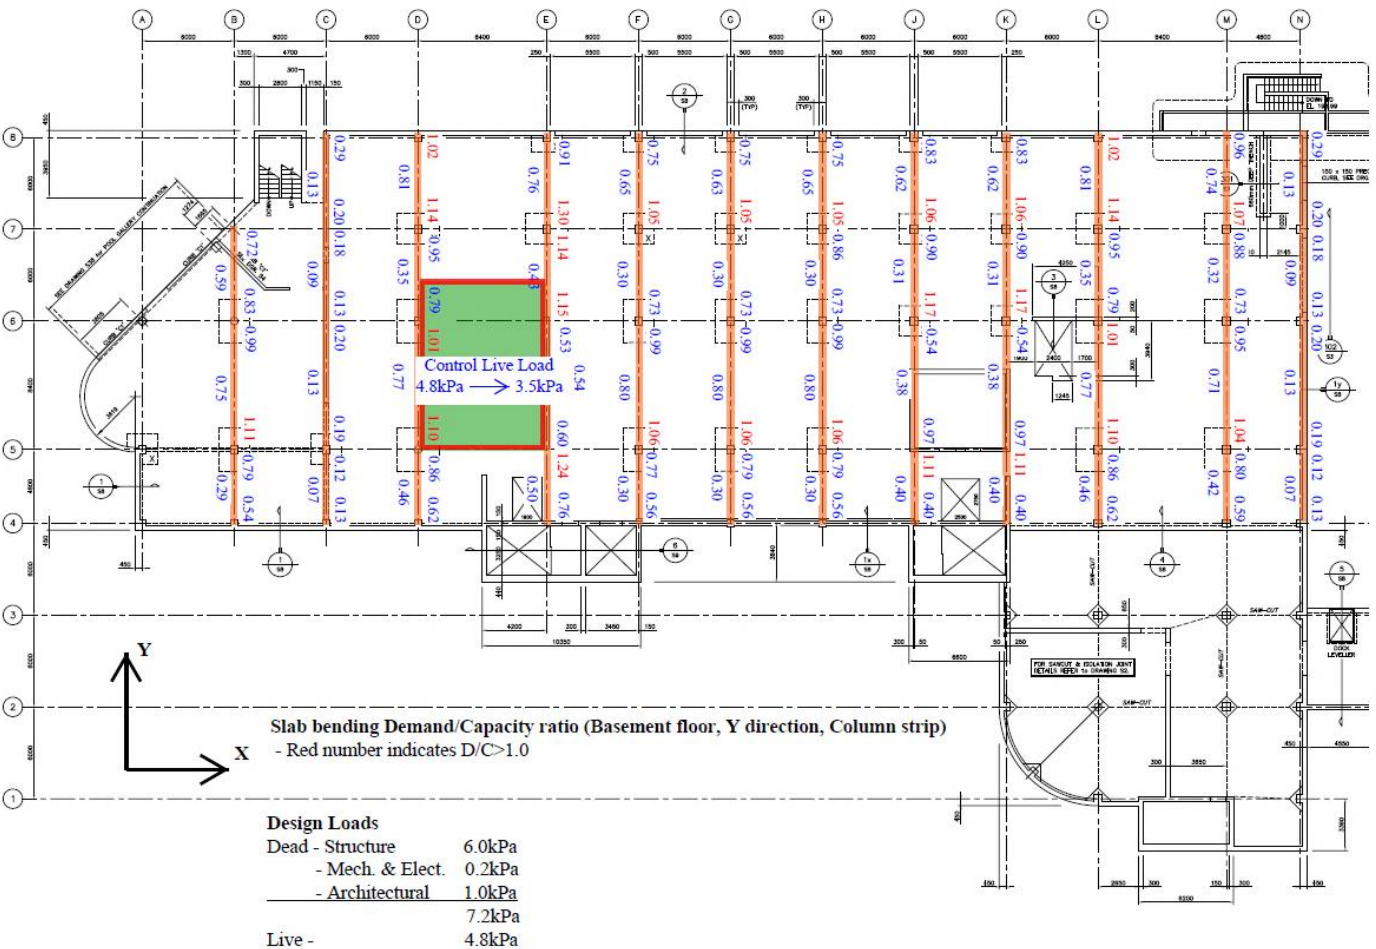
Slab bending D/C ratios (Basement floor, Y direction, Column strip)
